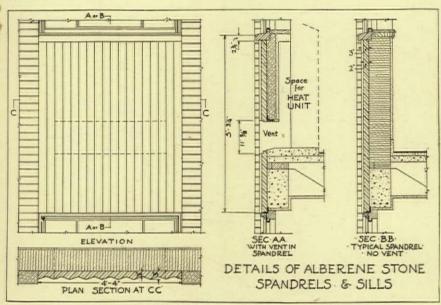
FIGURE I—Alberene Stone Spandrels as installed between 1st and 2nd story windows, Staatsburg School. (See illustration on preceding page.)
